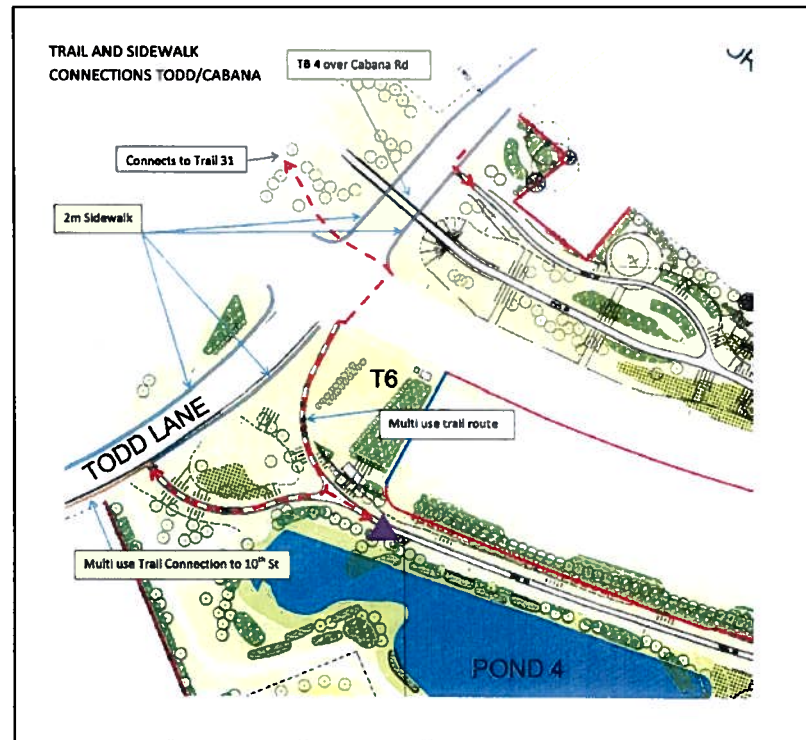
Trail and Sidewalk Connections on Cabana Road and Todd Lane
